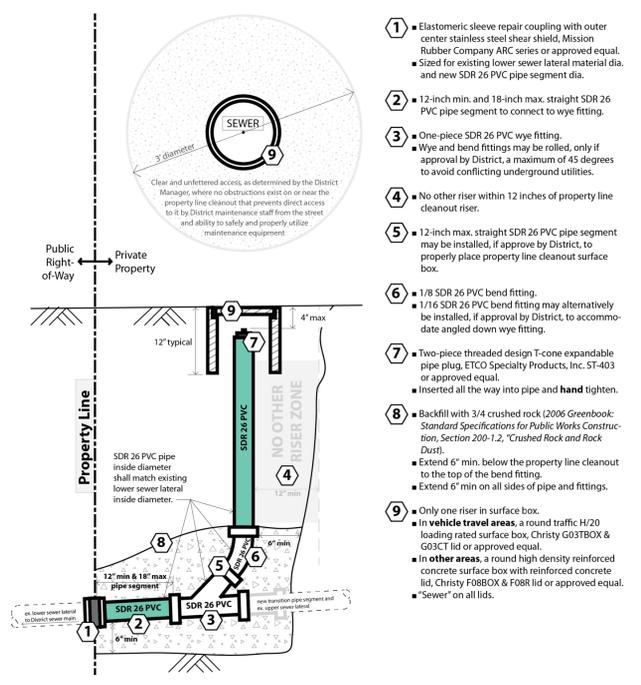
Installing property line cleanout to existing sewer lateral.
